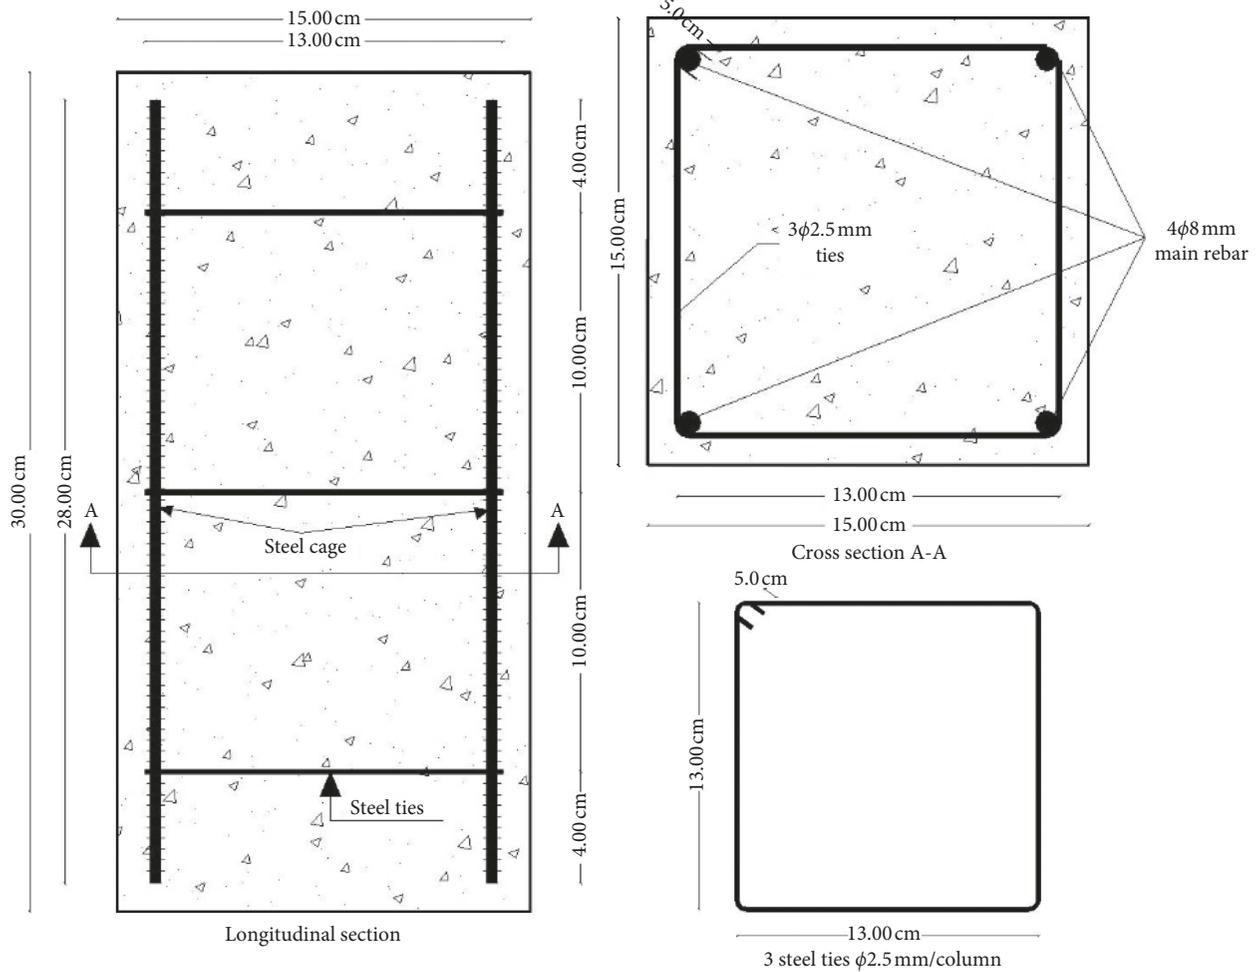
Geometry and reinforcement details of MC1 unjacketed reference columns.
